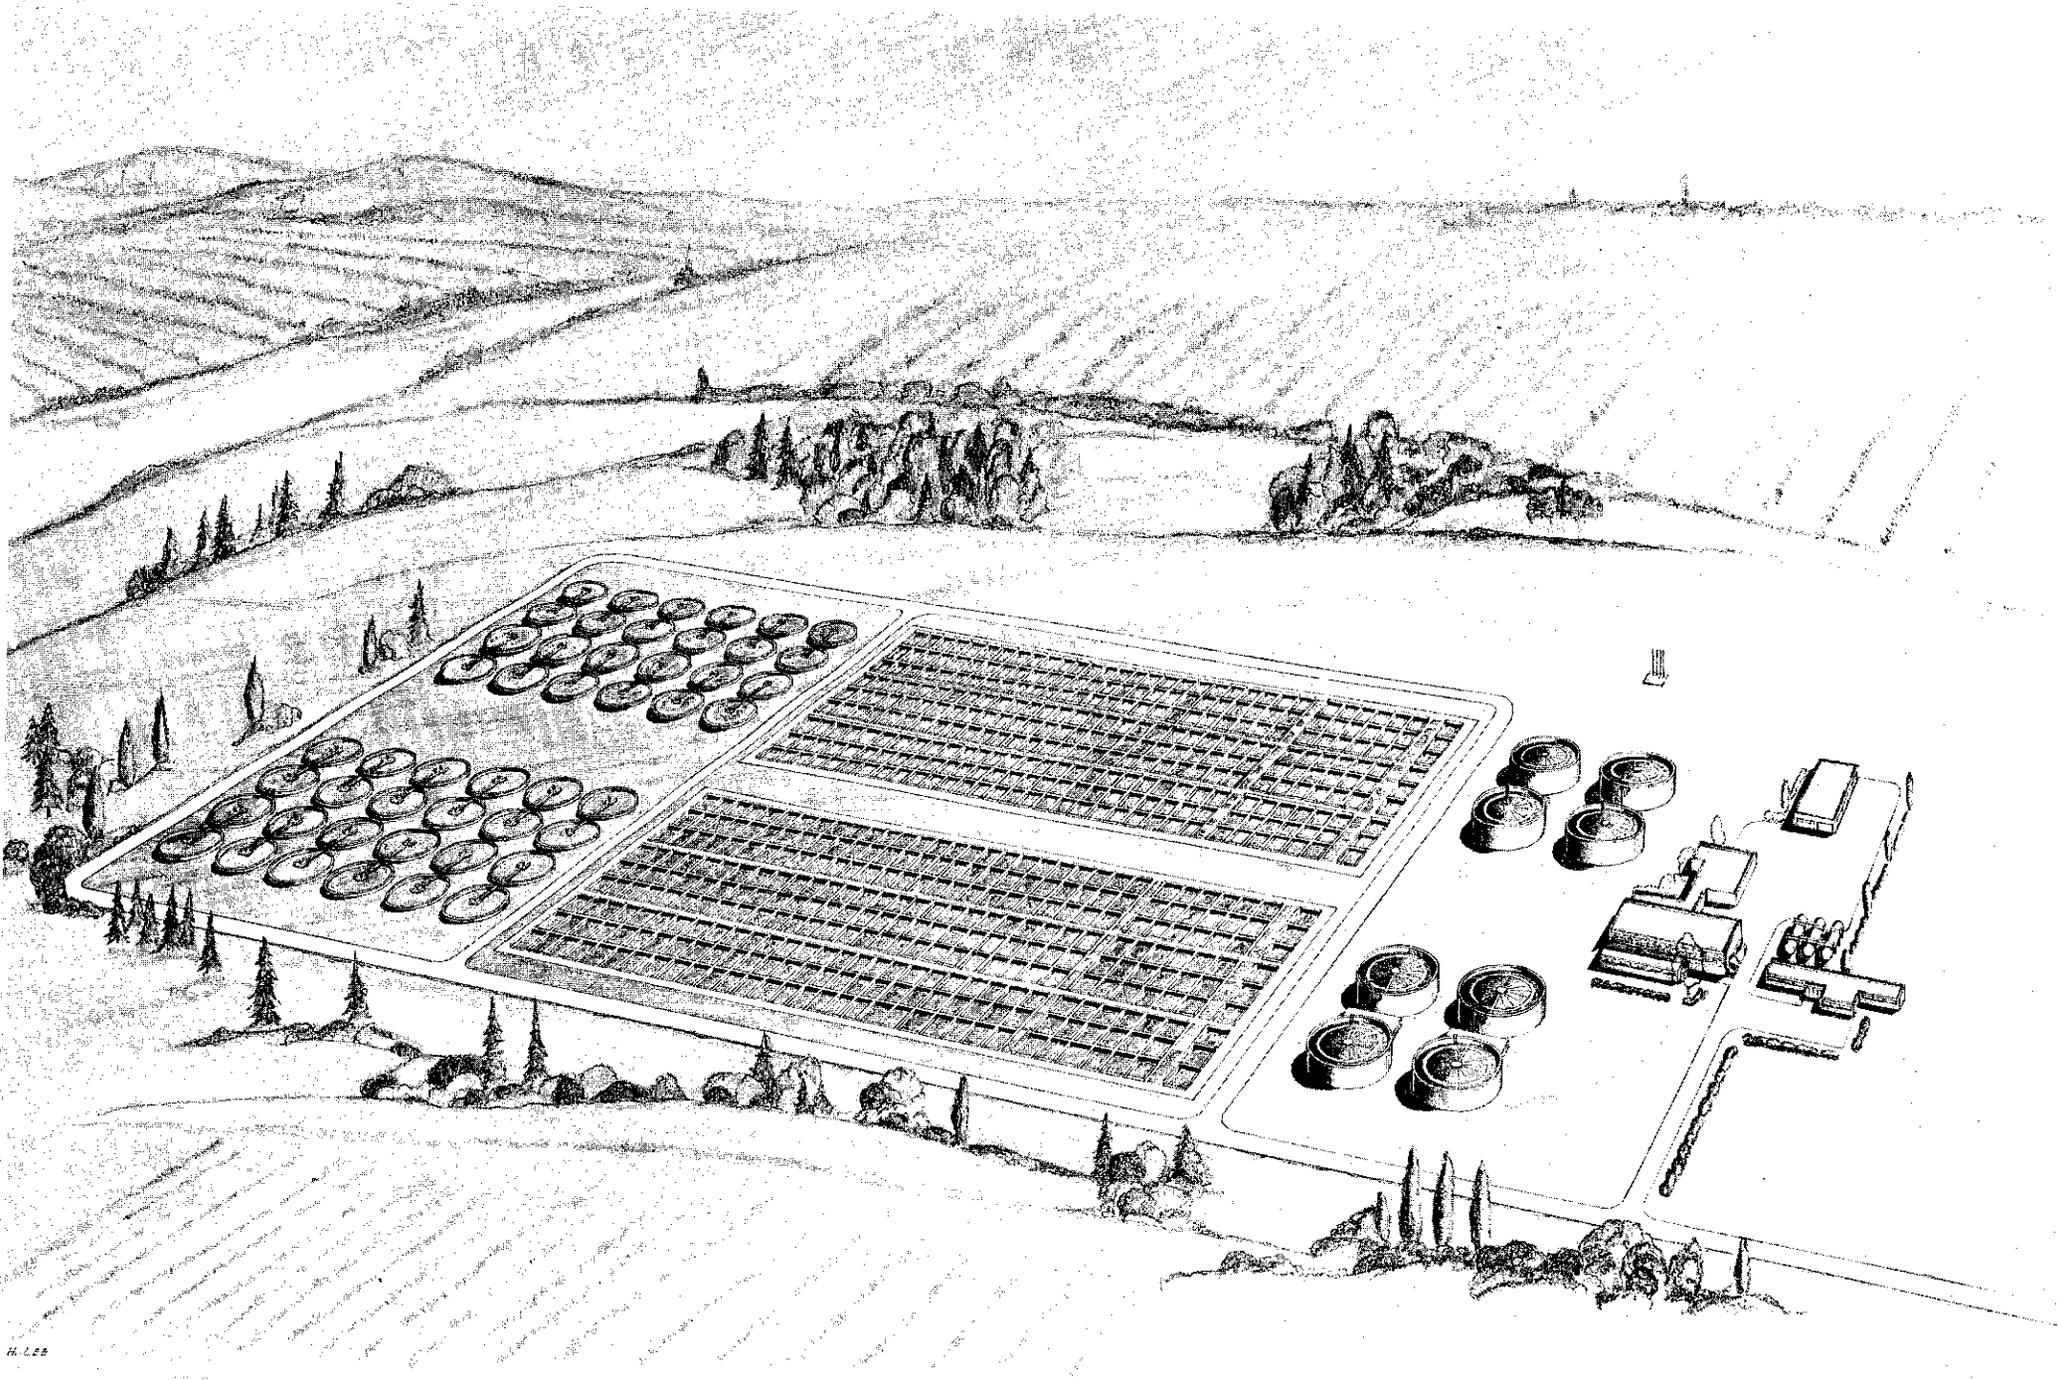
Perspective View of Renton Sewage Treatment Plant
